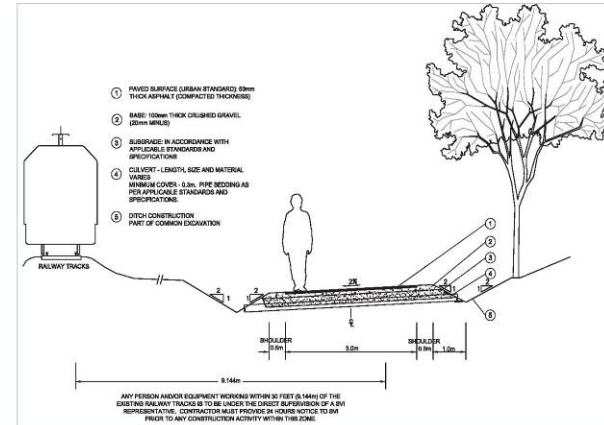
Typical Cross Section B: 30 metre (100 foot) corridor.
